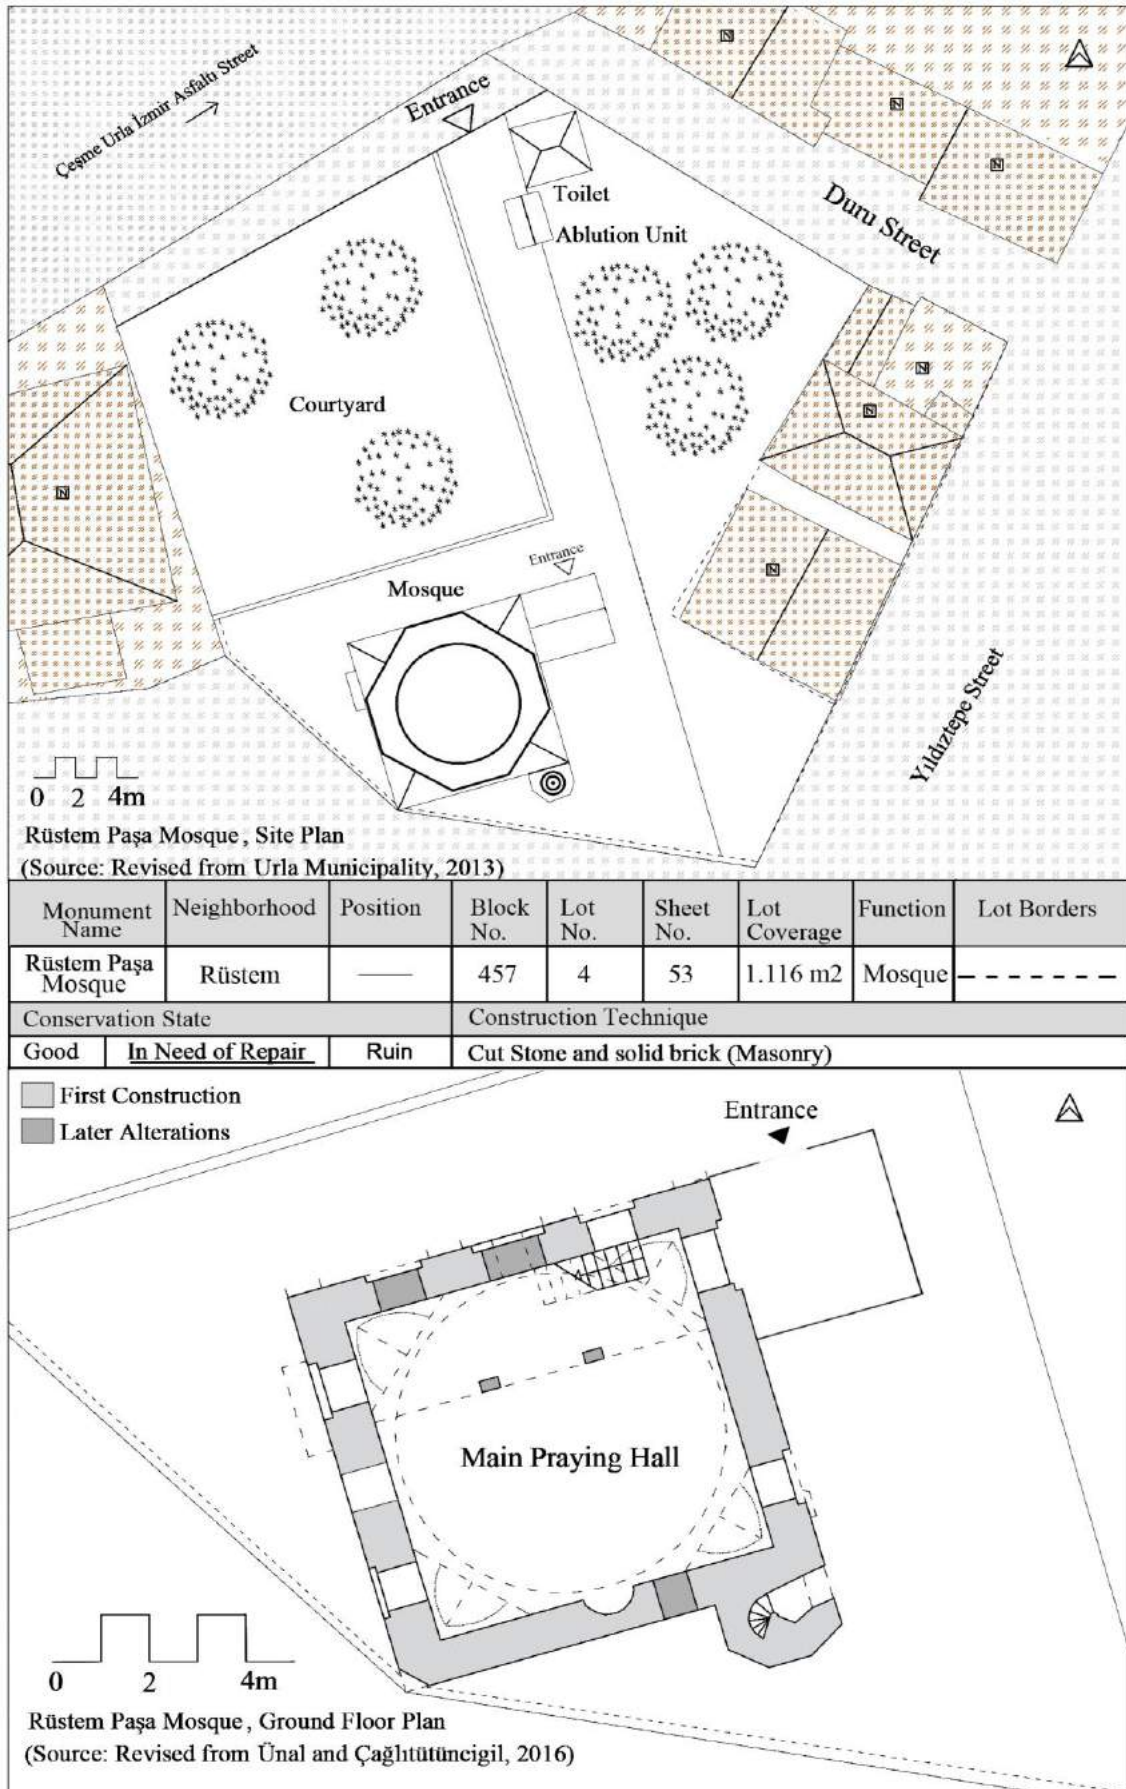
Site plan and ground floor plan, Rüstem Paşa Mosque
